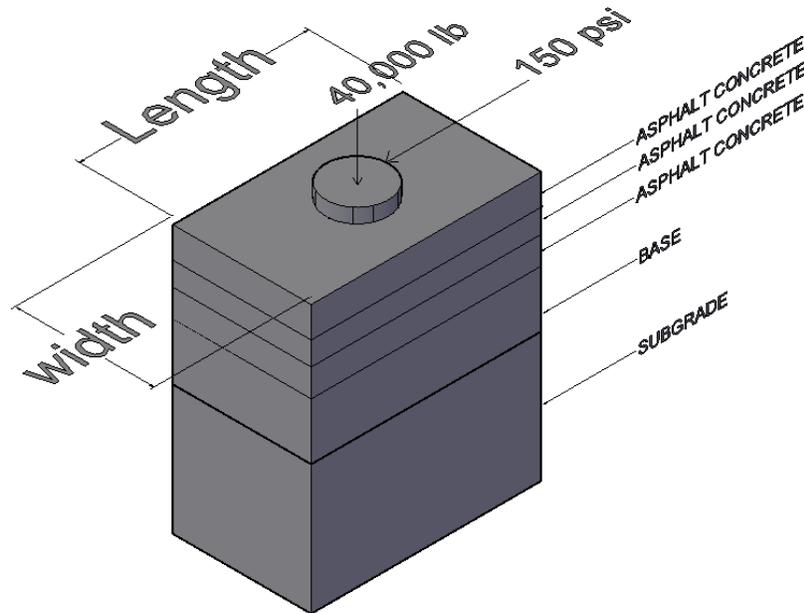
3D geometry of the asphalt concrete pavement layer.
